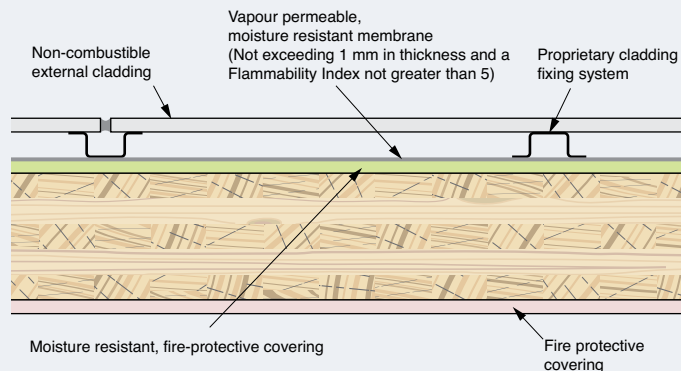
Fire-protected massive timber external wall with external lightweight cladding.
